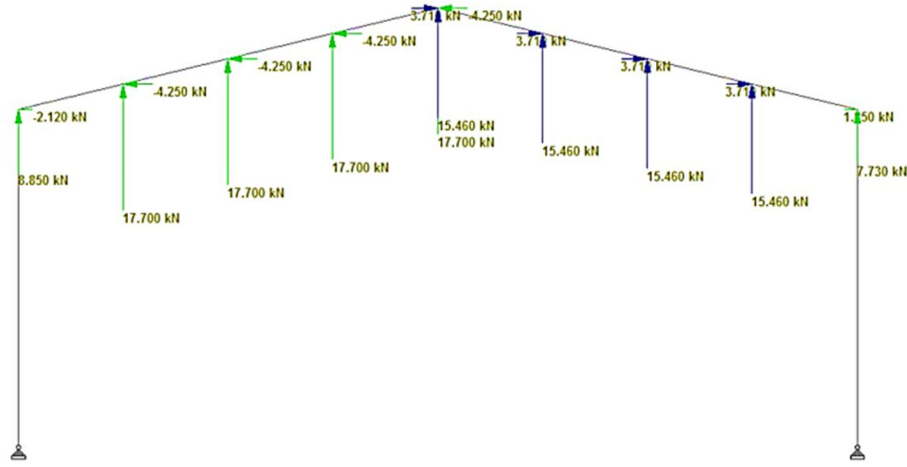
Wind loads acting at the purlin positions of pre-engineered steel frame for wind angle 90°
